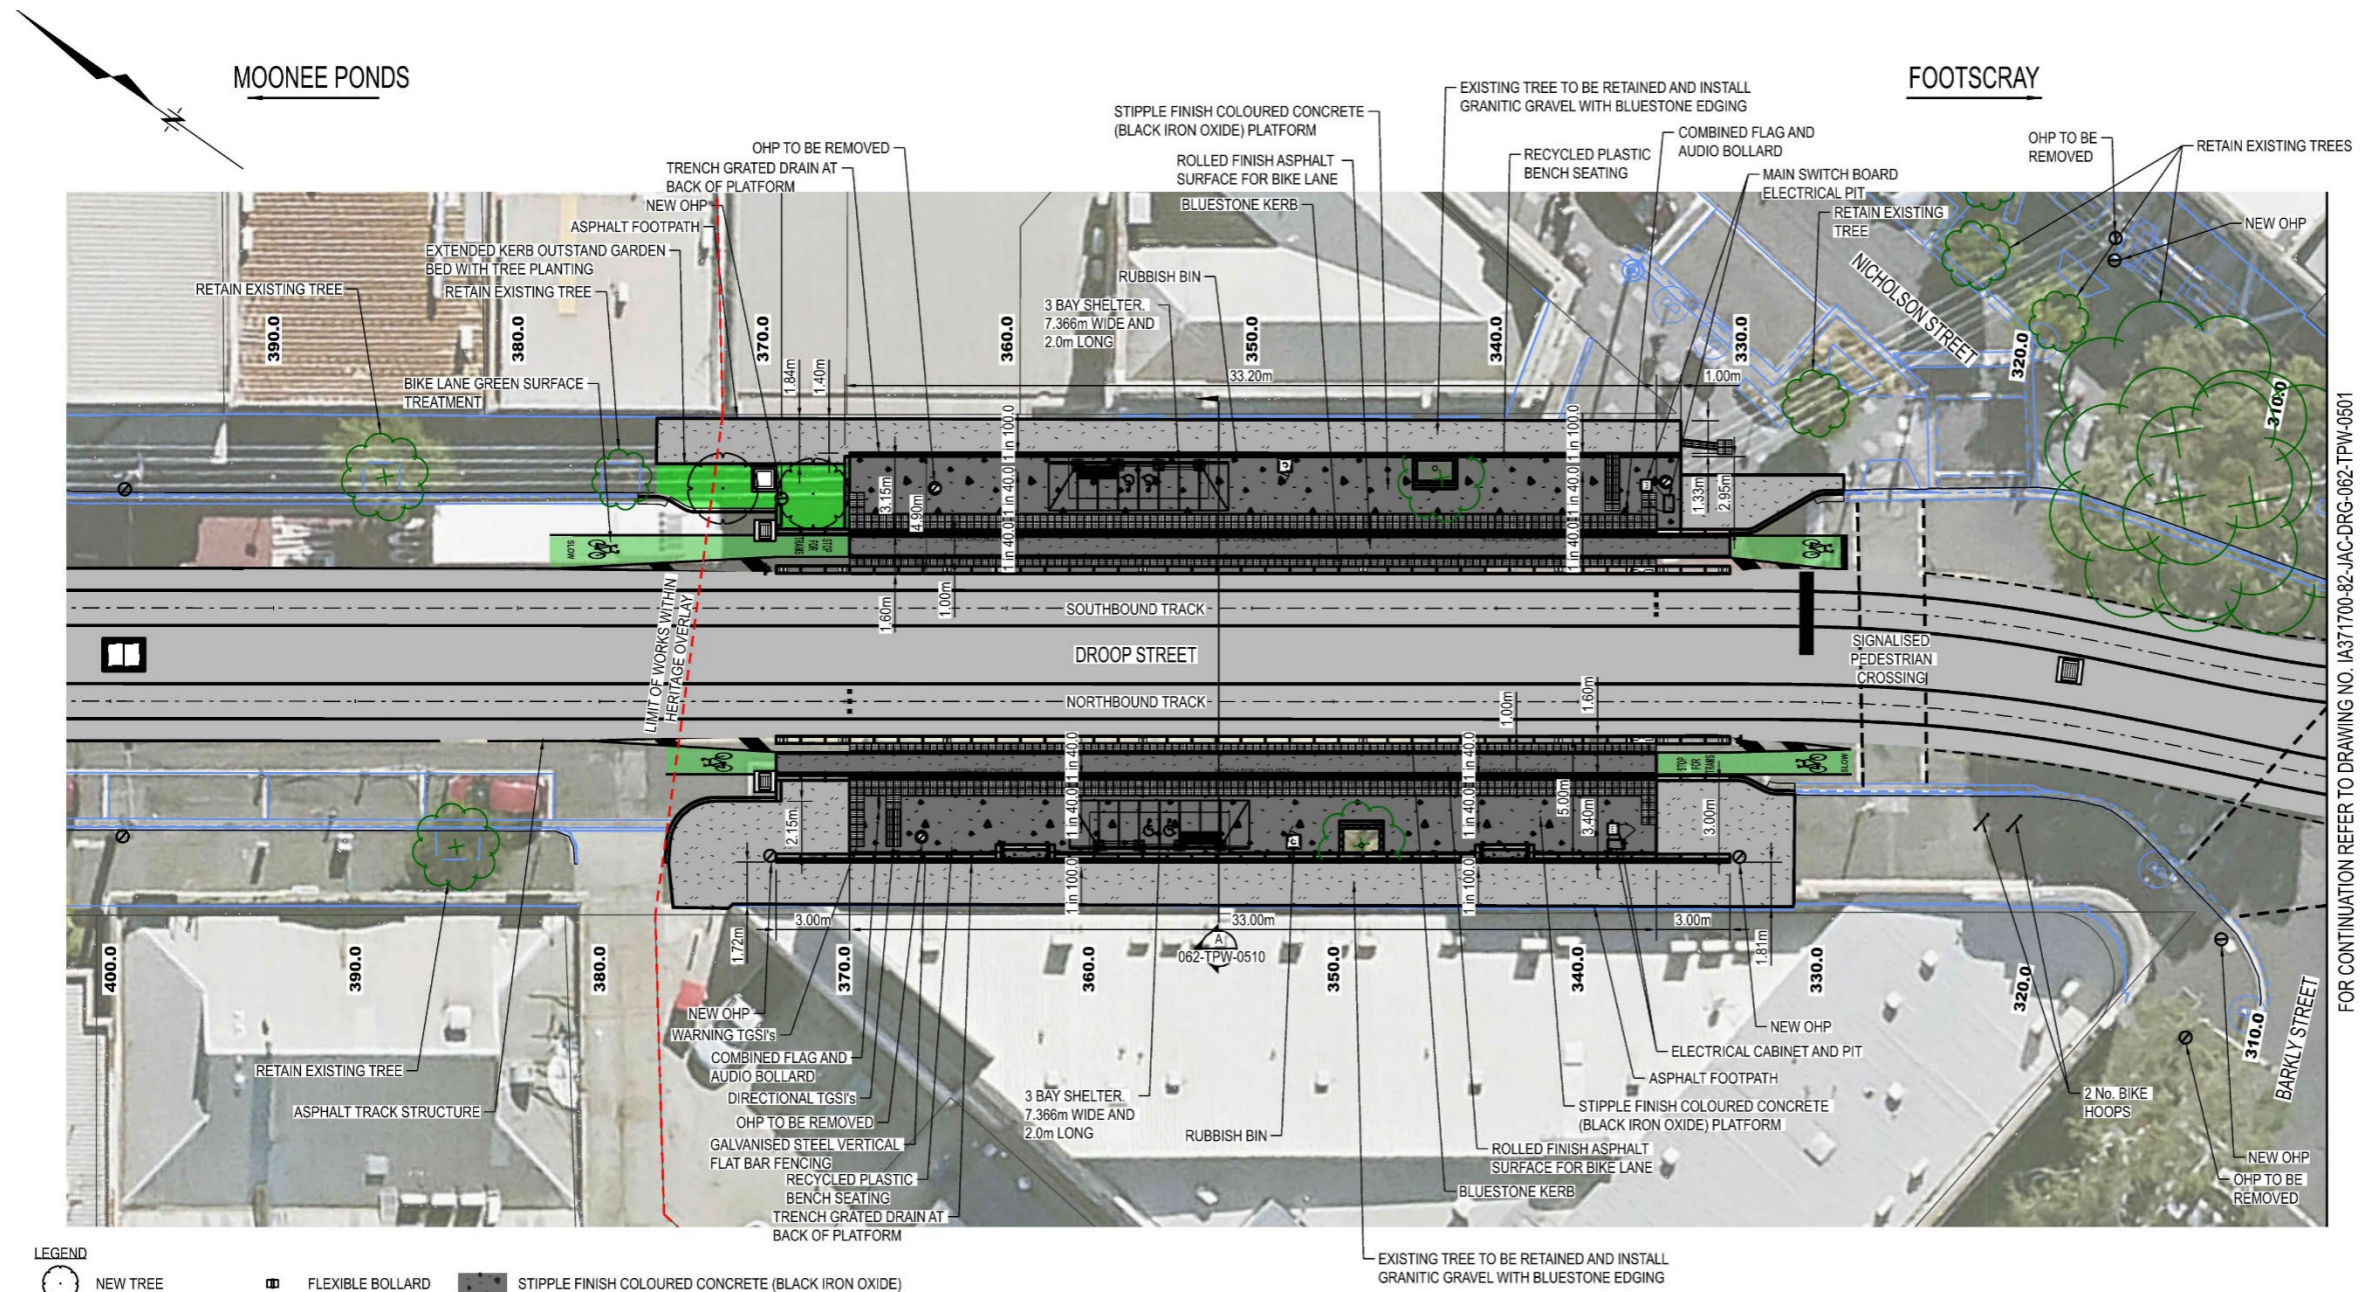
Overview plan and cross sections for Nicholson Street / Droop Street stop (northbound and southbound)
